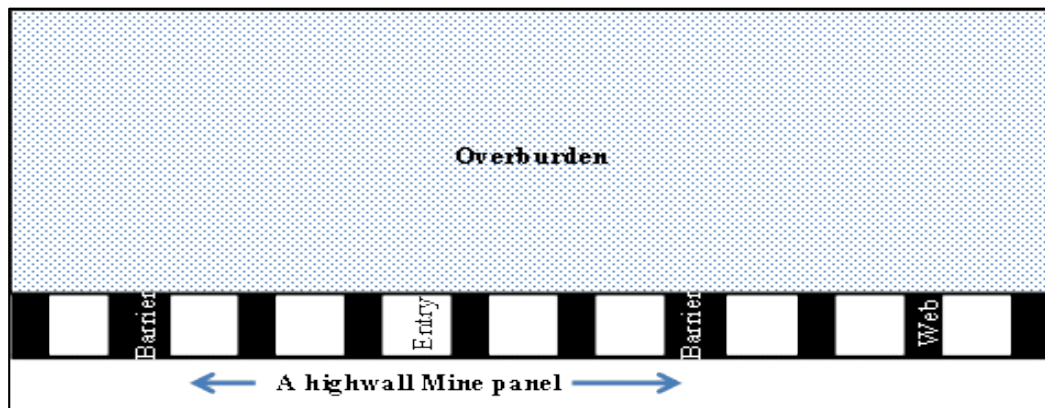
The cross-sectional view of the highwall mining layout (Luo, 2014)
